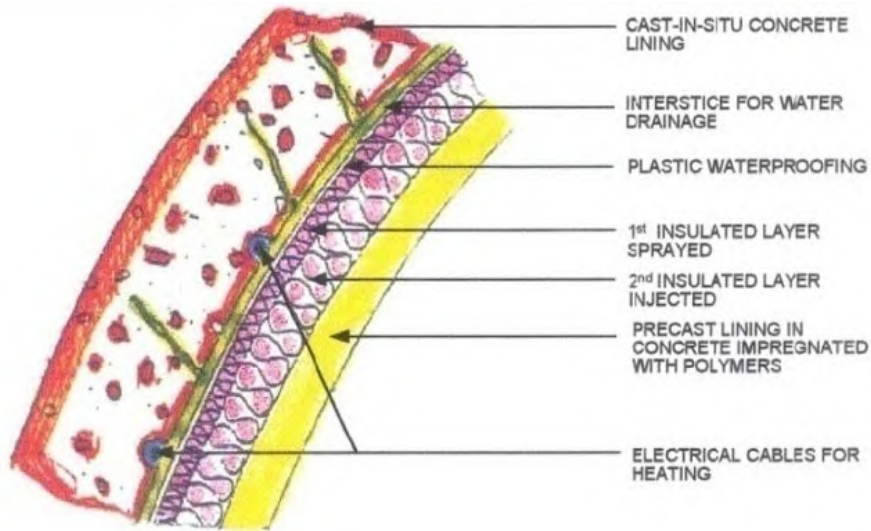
Leakage control on the interior face of an existing concrete tunnel using a space for water drainage, electrical heating cables, plastic waterproofing, sprayed insulating layer, and an interior precast liner (Russell, 2001).
